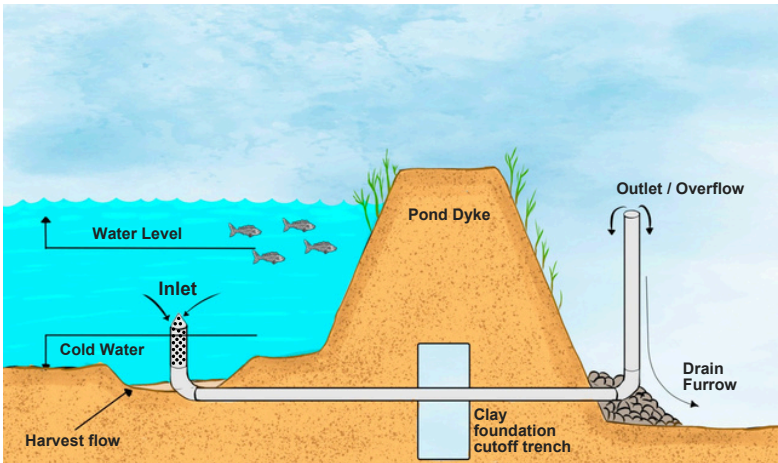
Cross-section of the pond dyke showing external upstand bottom drain system.
